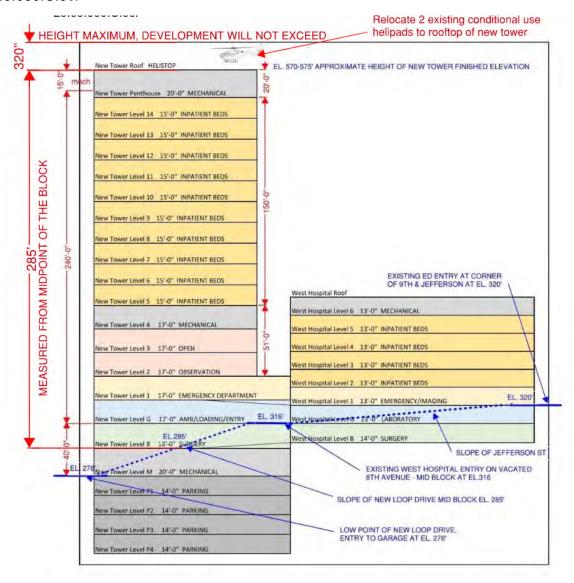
CROSS SECTION OF HEIGHT MEASUREMENT FOR PLANNED NEW PATIENT TOWER
